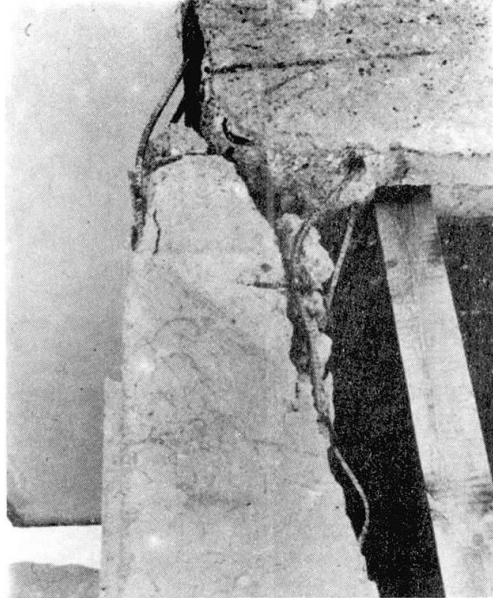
Shearing-off of a column at its connection with the crossbeam due to insufficient stirrups.
